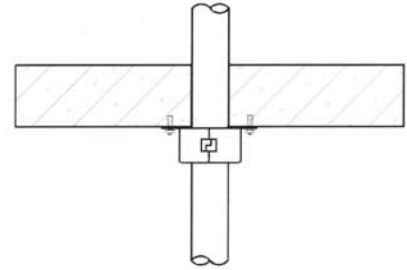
## Fig A. Surface Mounting to Timber or Steel Stud Drywall
